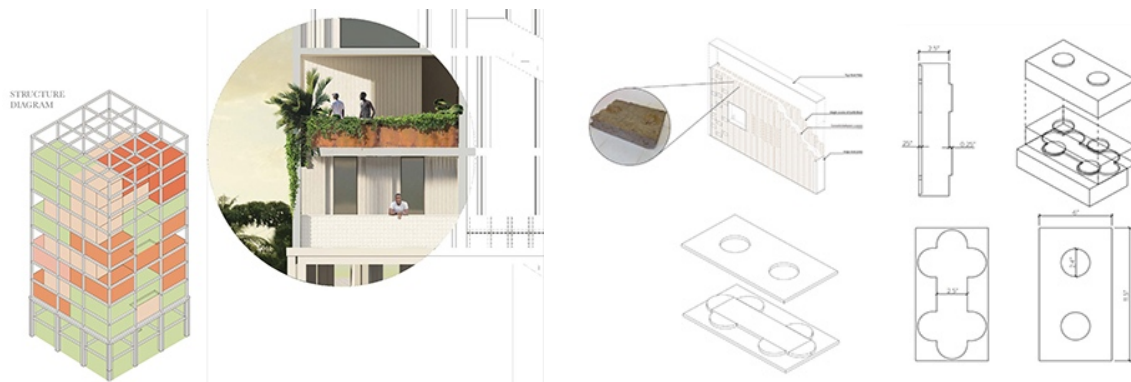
Frame and load bearing wall structural systems. Source: (Author 2020)
